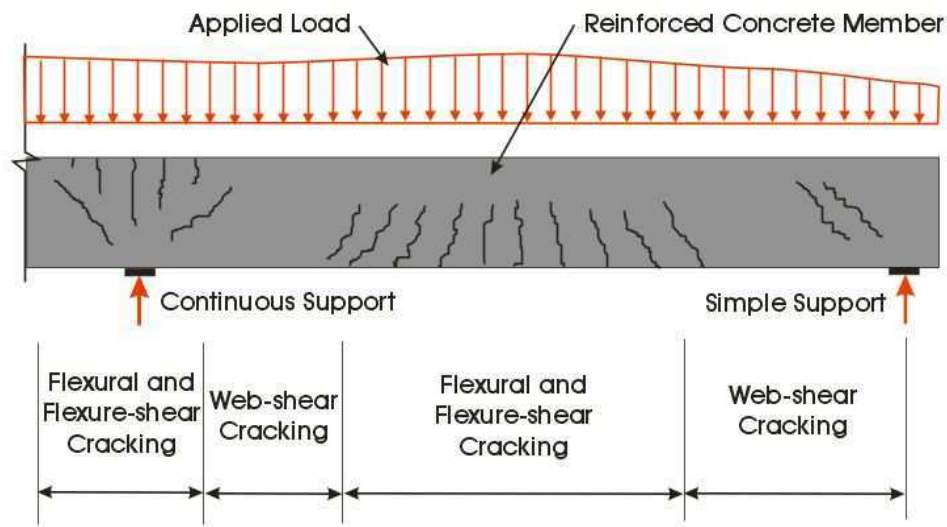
Types of cracking in concrete beams (Adapted from Standards New Zealand. 2006)
